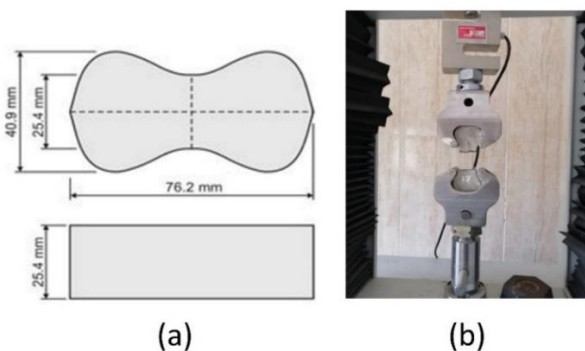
Tensile test specimen dimensions (a) and a specimen after the tensile test (b).
